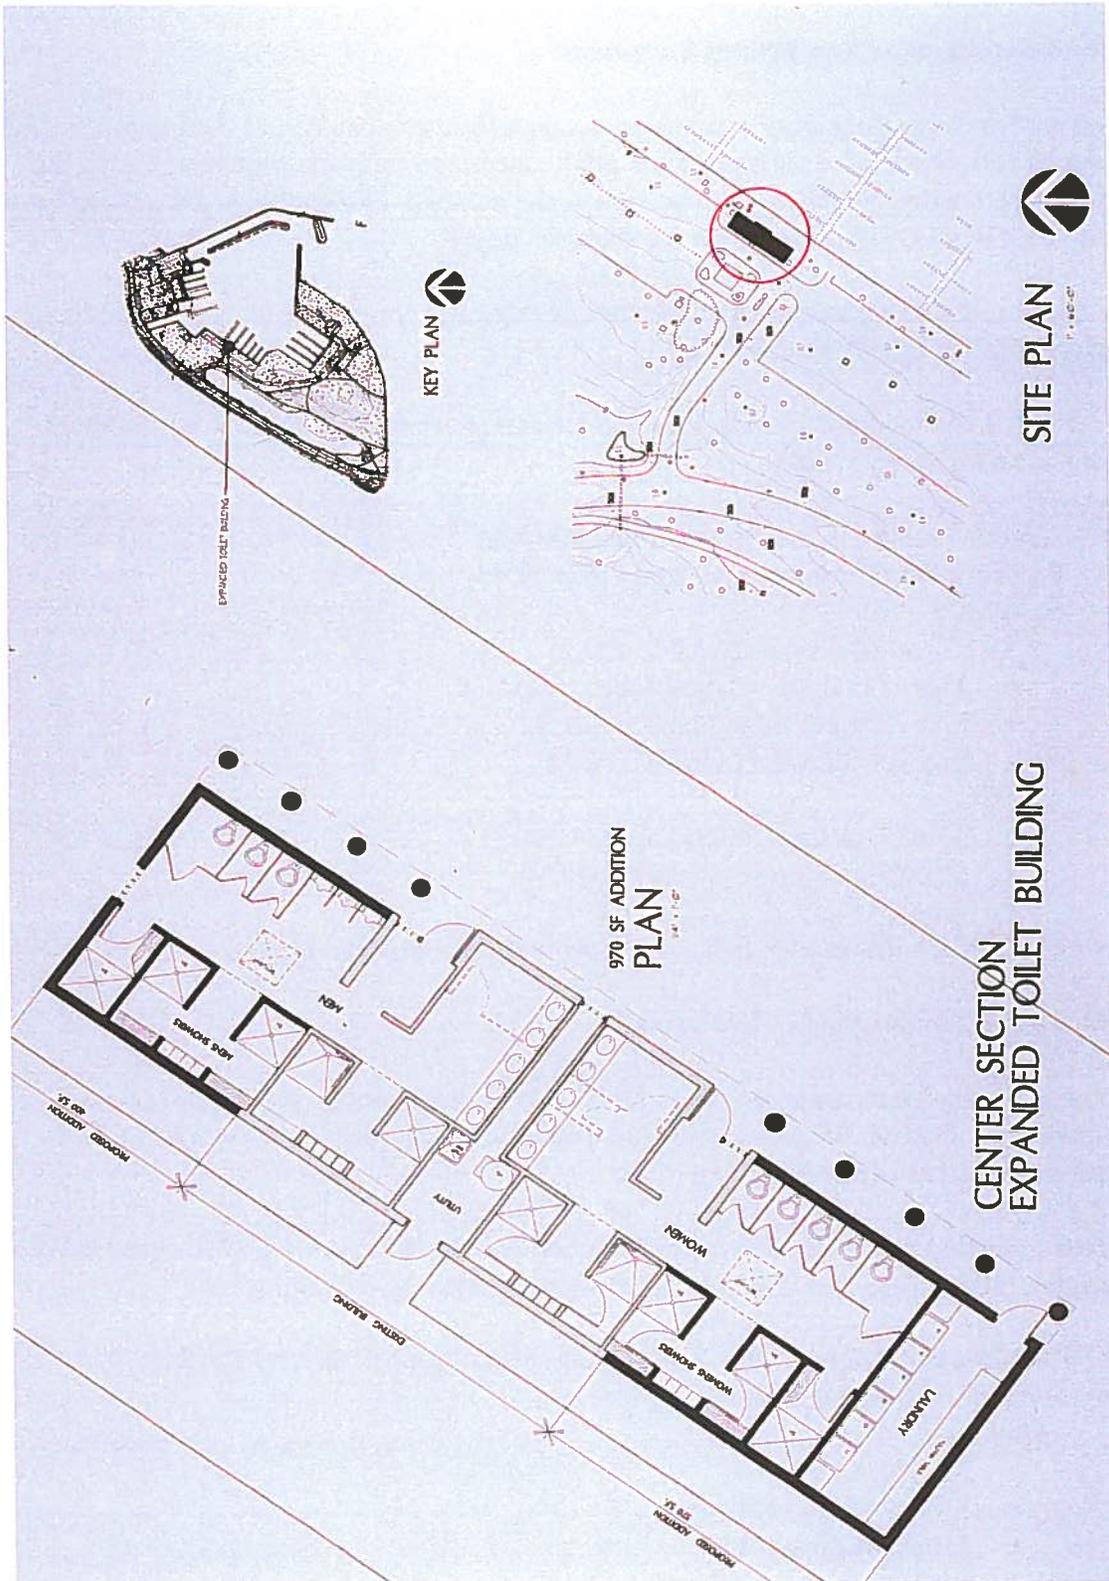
Proposed Center Section Slip Tenant Restroom Expansion
